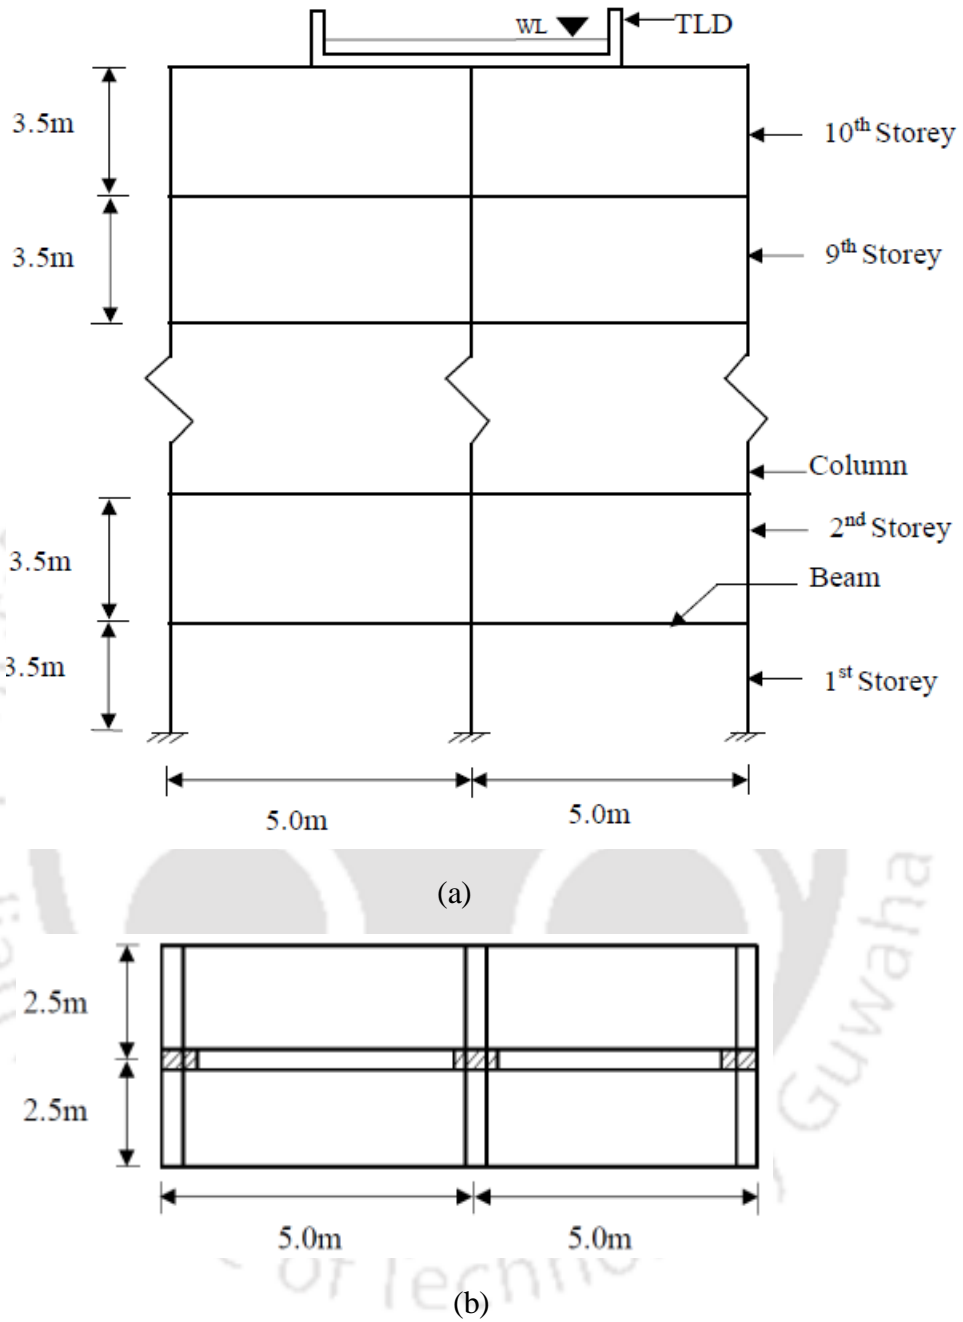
Structural model of a 2D representative frame (a) Elevation, (b) Plan
